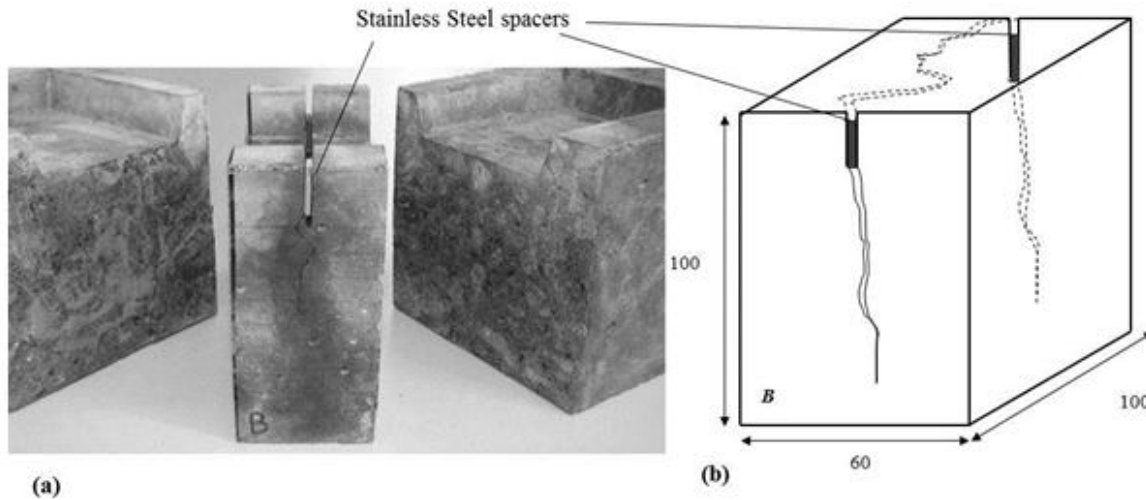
Photograph of a typical central portion of a beam cut from rest of the beam, illustrating a cracked section of beam.
